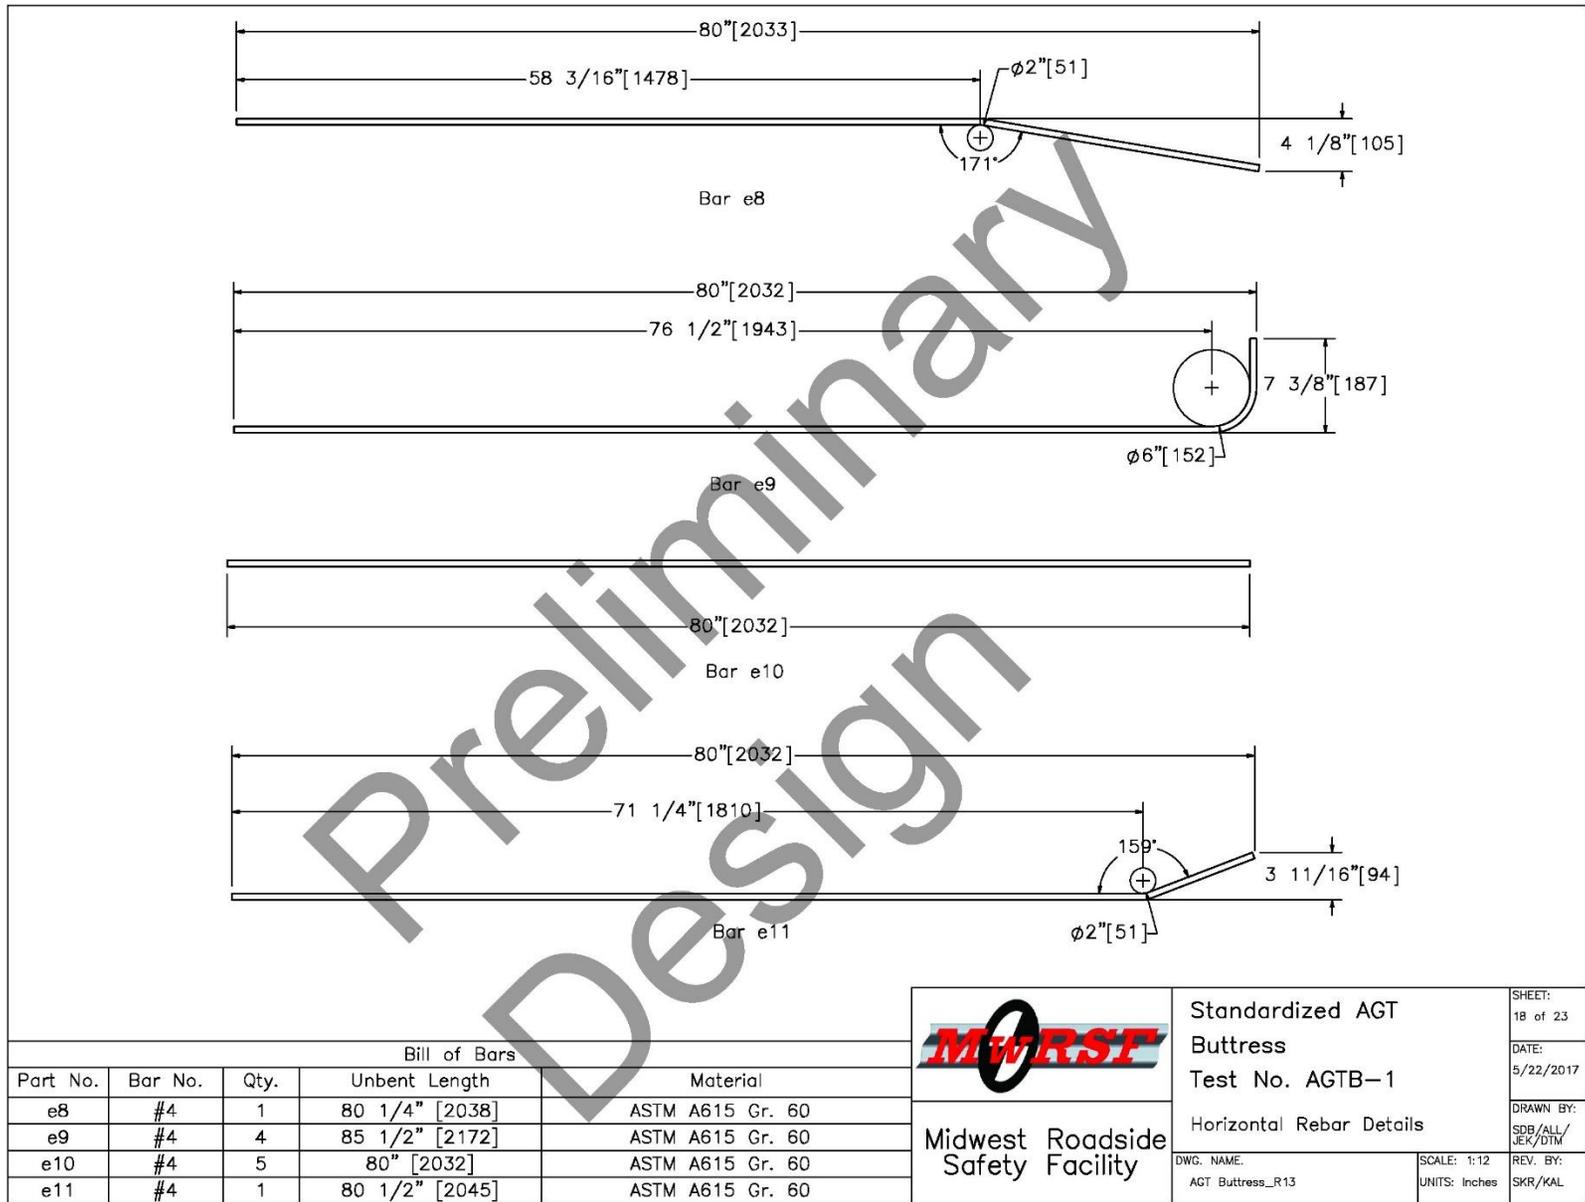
Buttress Horizontal Rebar Details and Bill of Bars, Test No. AGTB-1
